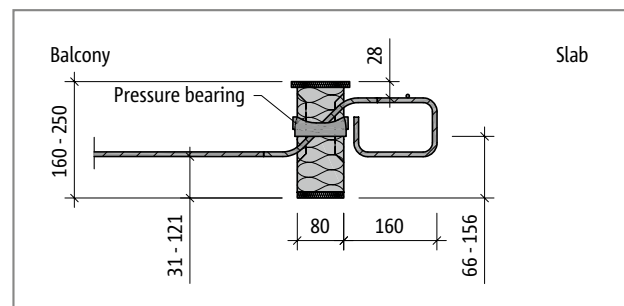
Schöck Isokorb® T type Q-E-W-V4: Product section
